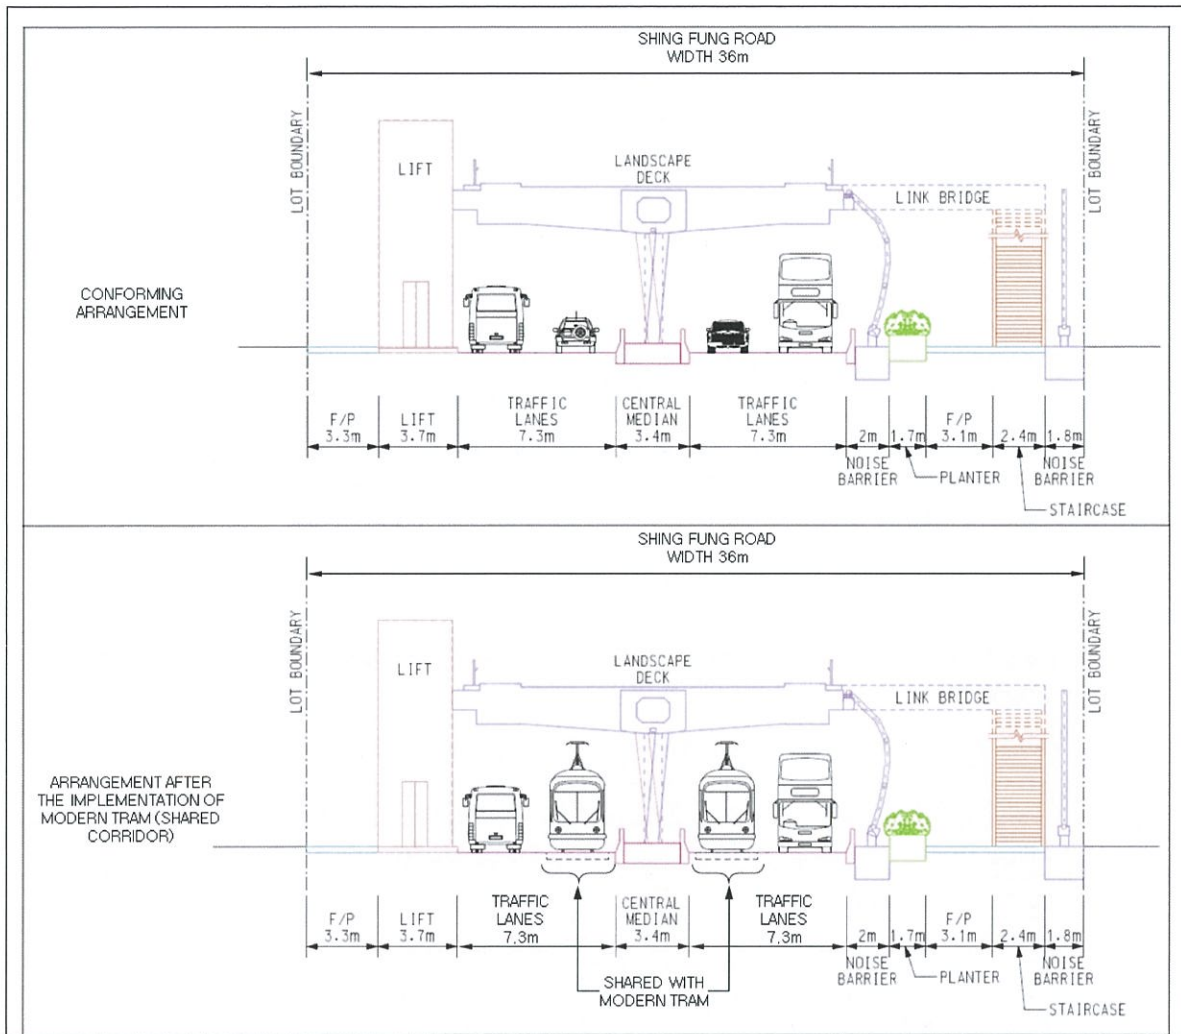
Typical Cross Section Plan of Option 2 (At-Grade Shared Corridor) on Shing Fung Road (Before and After Implementation)
